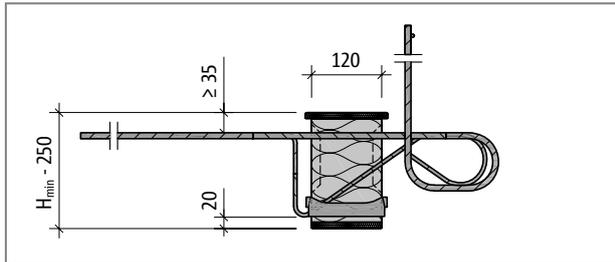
Schöck Isokorb® XT type K-WO: Product section
